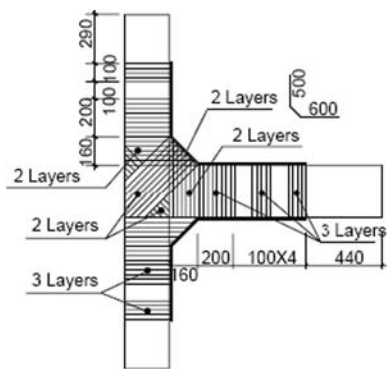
CFRP and concrete haunch retrofitted joint
